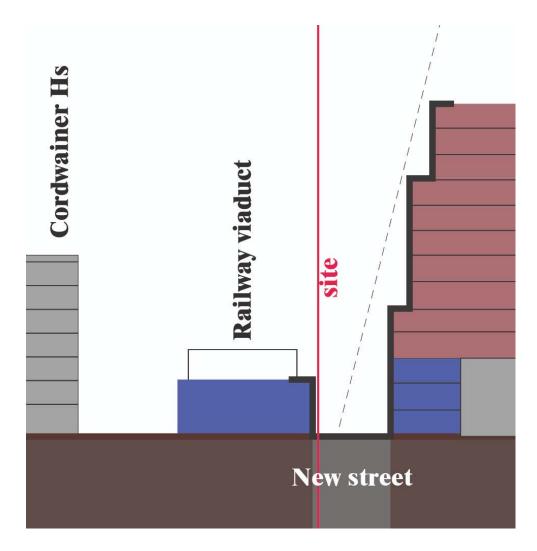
Fig X: section diagram showing an example of the railway arches a contemporary working yard and the potential relationship of street width to height of the buildings that enclose it<sup>56</sup>
